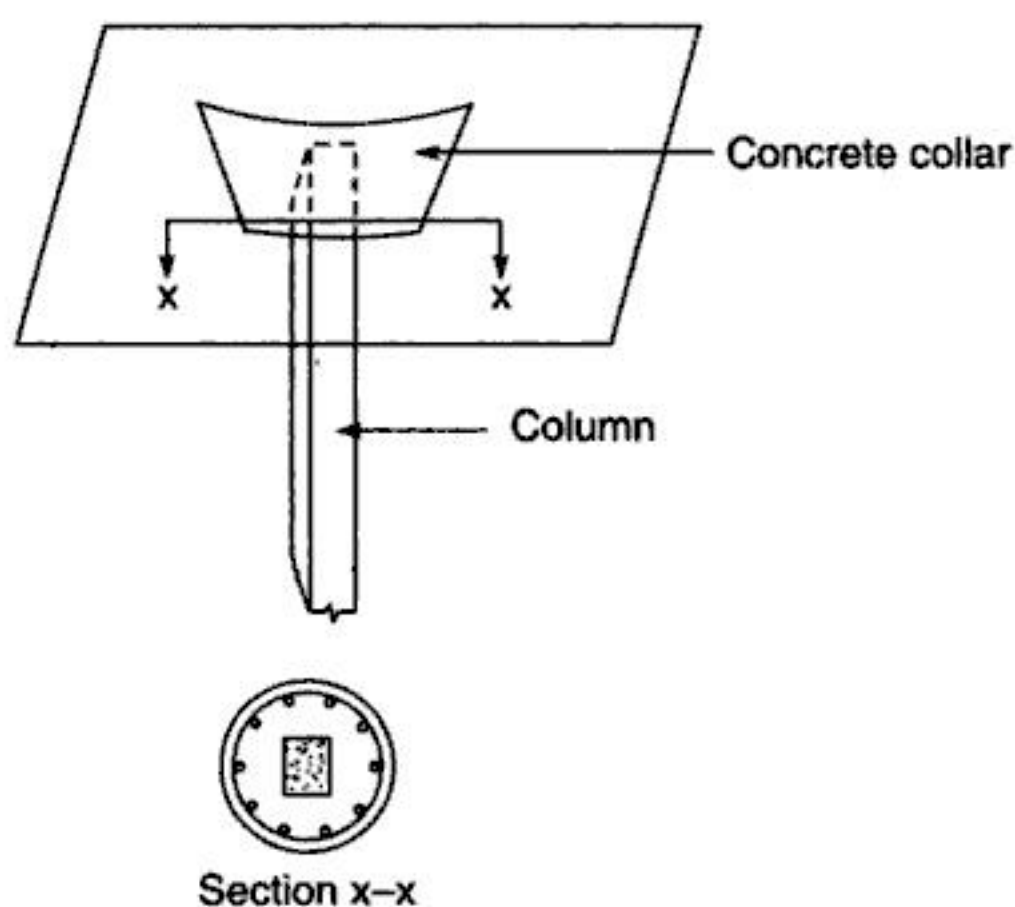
Strengthening of a slab and column connection using a concrete collar
